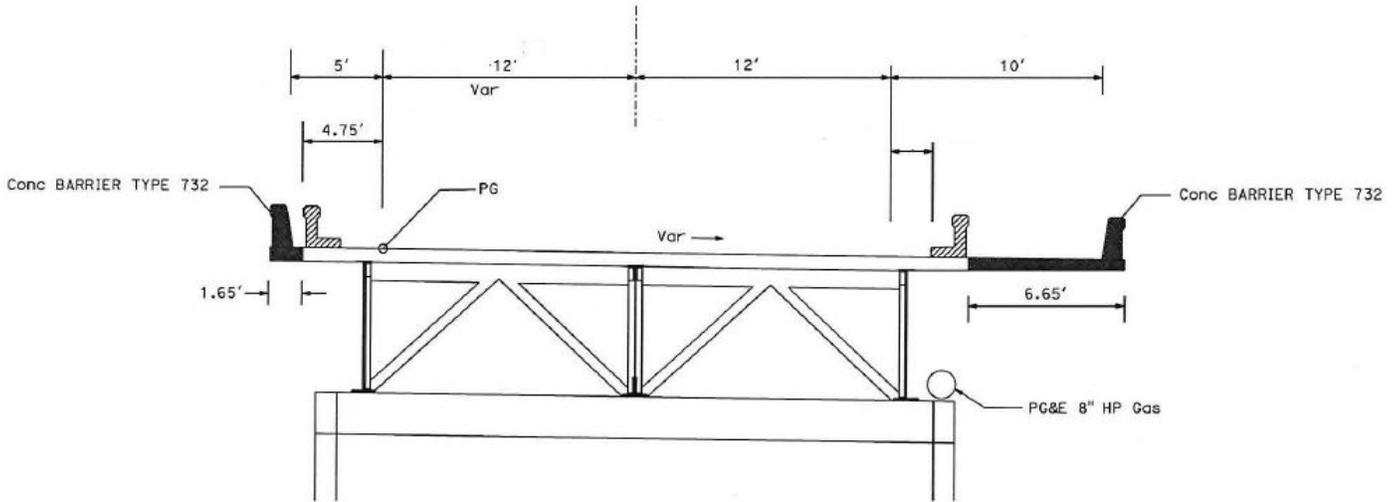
3 Bridge widening cross section (northbound bridge)
